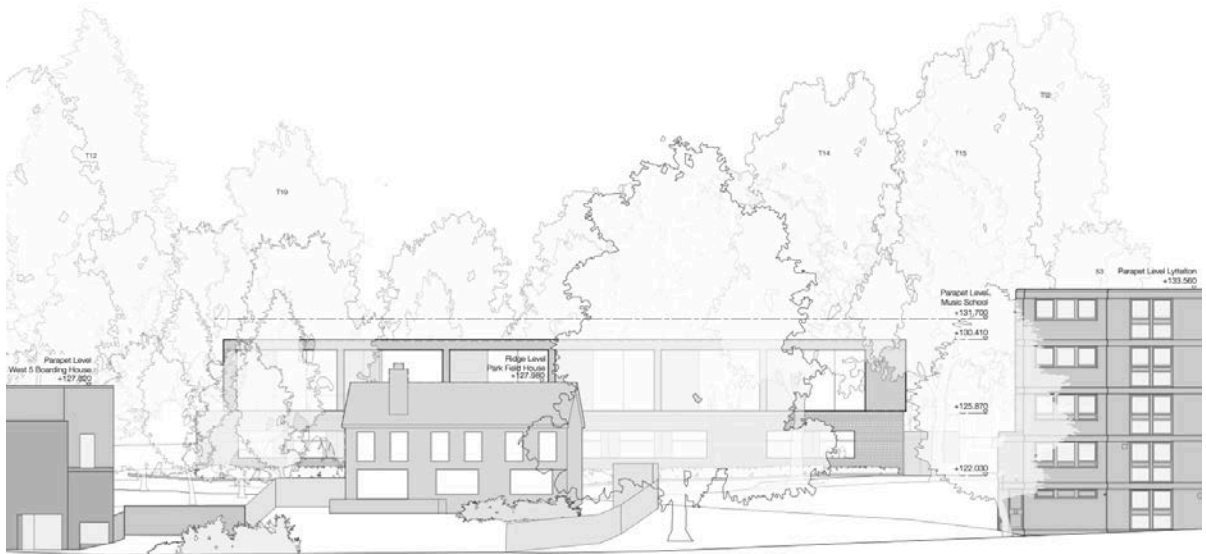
South east elevation of the proposed DTE building in the centre of the image behind Park Field House. West 5 Boarding house lies to the left and Lyttelton to the right (extract from Design Engine drawing 1617-P360 P01).
